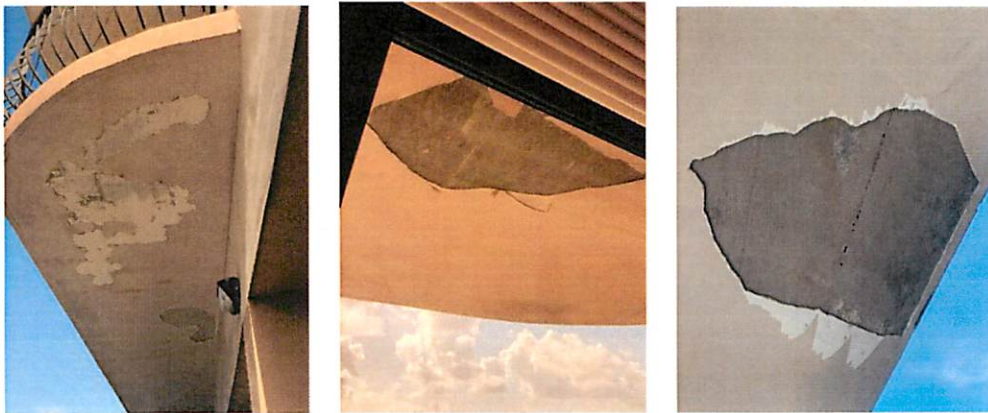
Figure D: Balcony Soffit paint spalling in units 208, 703, & 1301.
